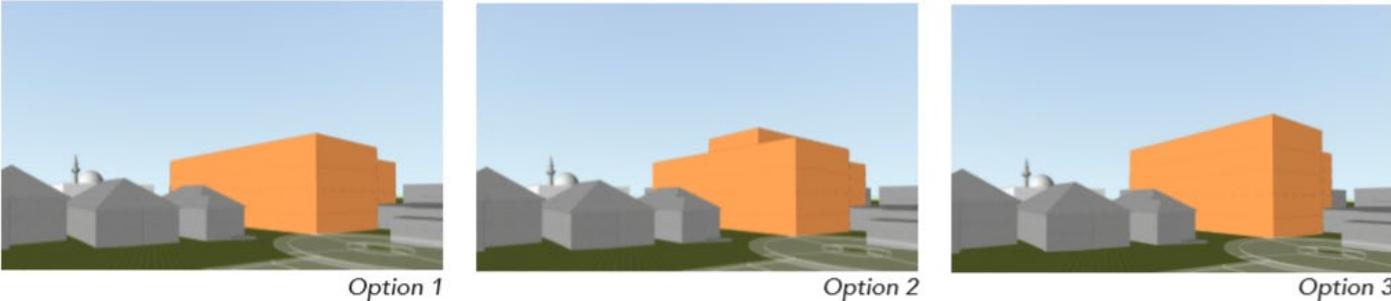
Modelling of building envelopes (Source: Olsson Architects)
